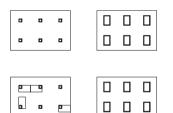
Hollow columns – slender floor slabs Schemes showing loadbearing structure (top) and interior fitting-out (bottom); the wet rooms are linked to the loadbearing structure containing the services.
